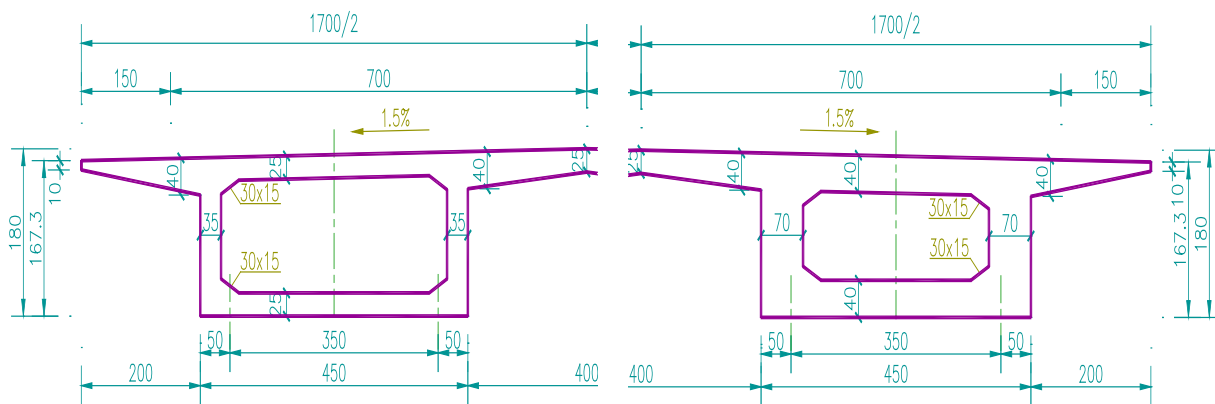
The layout of transverse section of the bridge; (a) Half section of mid-span box girder, (b) Half section of pier box girder (dimension in cm)
